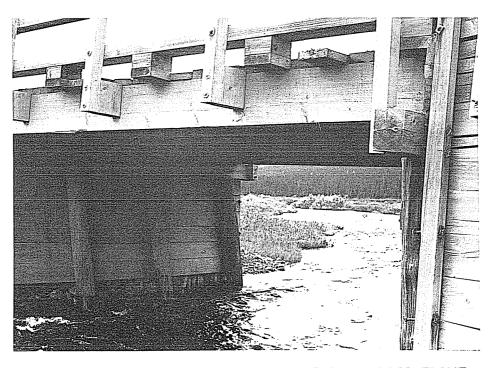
D.4 DENALI HIGHWAY BRIDGE. TYPICAL WOOD-FRAME STREAM CROSSING
